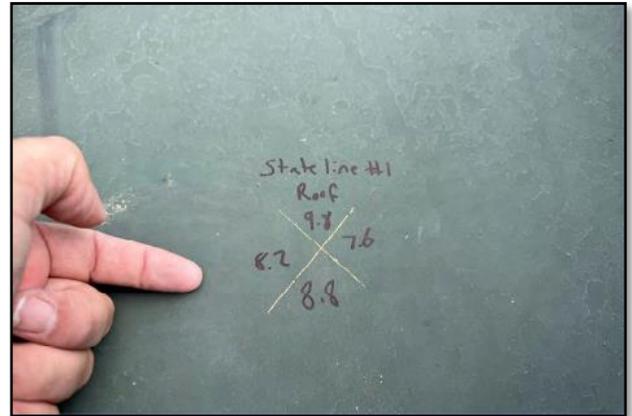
The Tank 1 exterior roof is rated a 8 per ASTM D6677. Photo courtesy of CSI.
